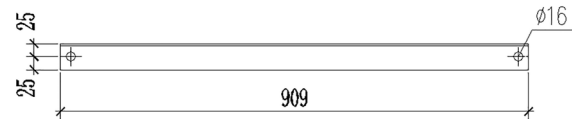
Dimension of diagonal bracing (unit: mm)
